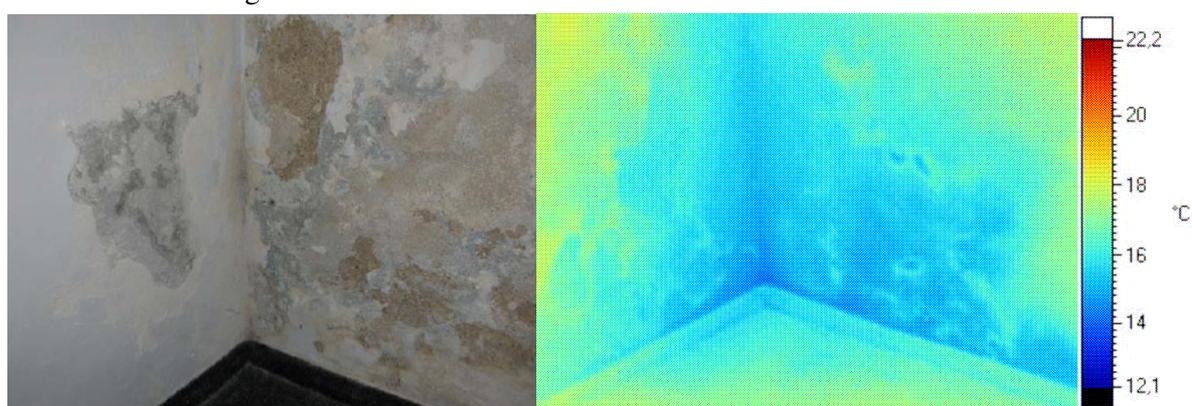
Photo and thermogram of the corner between the window wall and side wall
